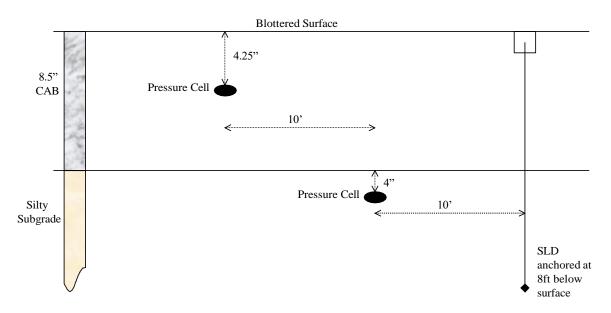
Blotter Pavement Section on 348th Avenue near SD26
